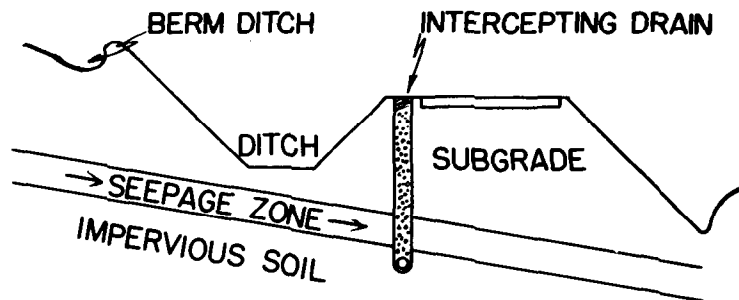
Adequate Drainage Consists of Intercepting and Removing All Free Surface and Underground Water Which May Damage the Roadway.
